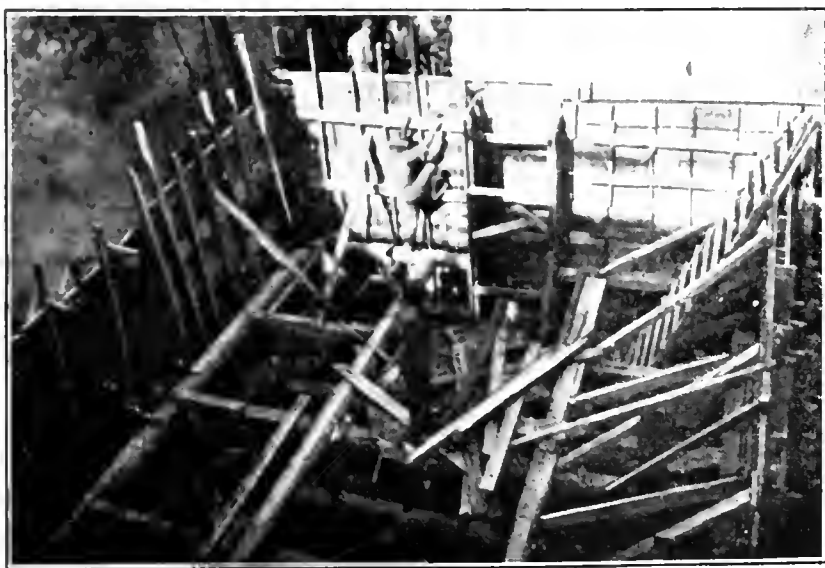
WOODEN FORMS IN PLACE FOR CONCRETE LINING OF GUN-SHRINKING PIT
